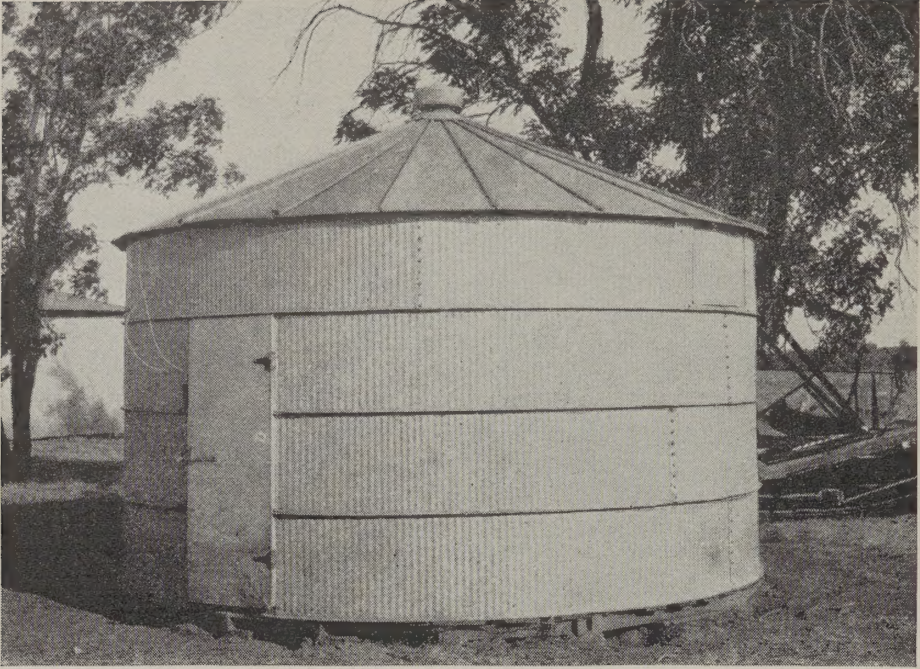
An acceptable bin if inspection shows that roof and wall joints are tight and there are no leaks around doors. The location in a clean, shaded place away from other buildings is good.
